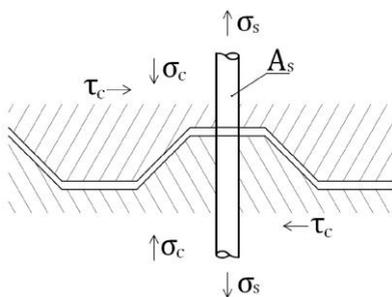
General scheme of interaction of wall parts, divided by a crack.
